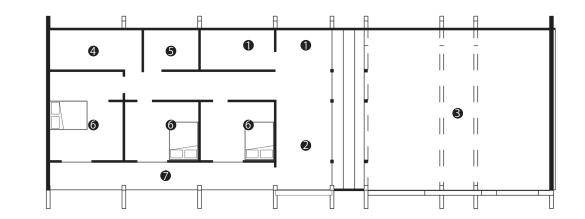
Plan - Author's own Scale 1:200 at A4 1:100 at A2
